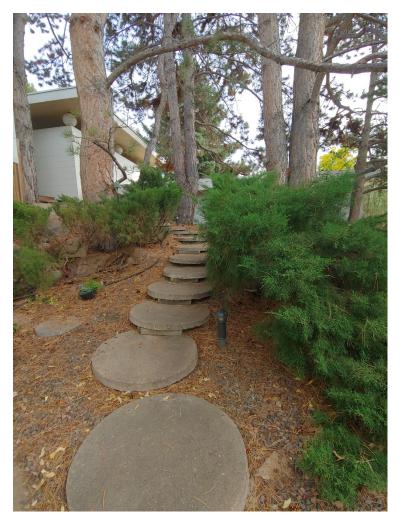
Backyard concrete steps to breezeway deck (original, according to owner)
